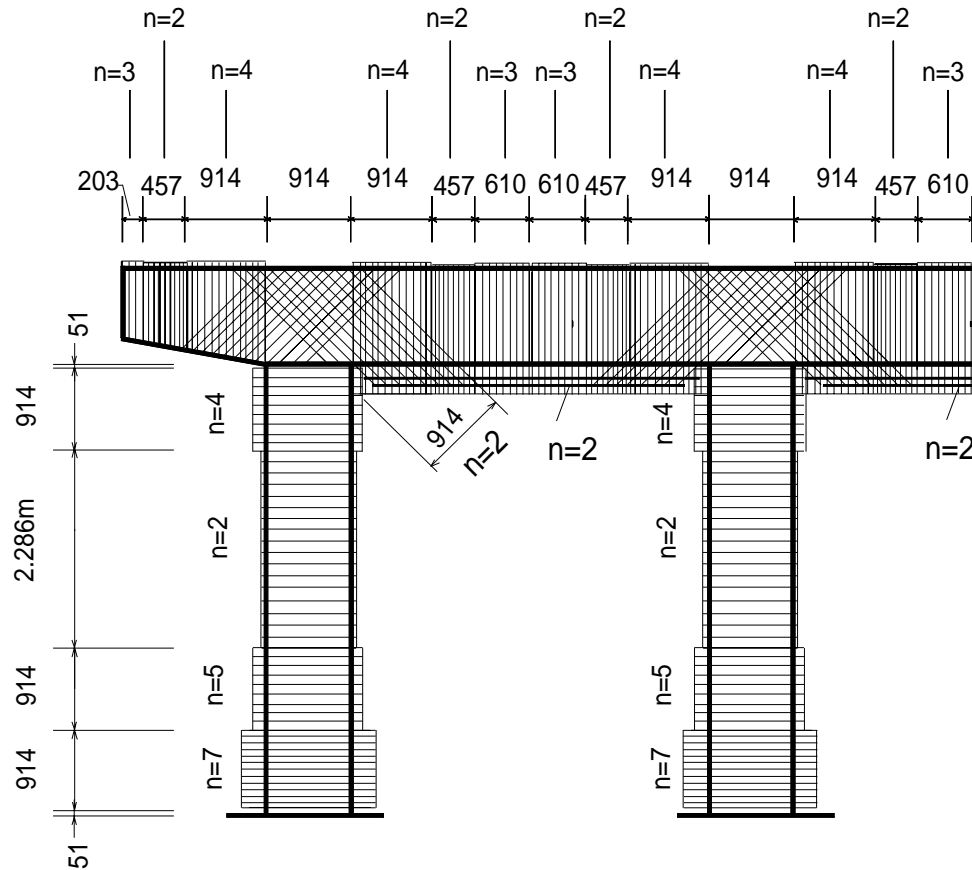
CFRP composite design for columns, bent cap, and joint “ankle wrap”
